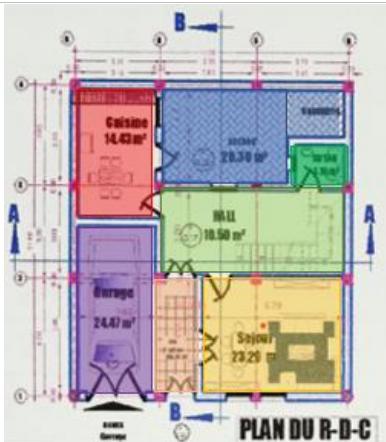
ground floor plan type two of the master plan, 72 housing units in Sidi Okba, Biskra
